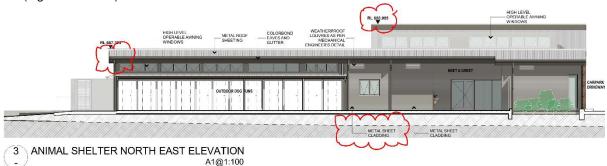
A: Change to section of wall on north-eastern (and south-eastern) façade – s.4.55 Modification (source: F&J Tepa)
